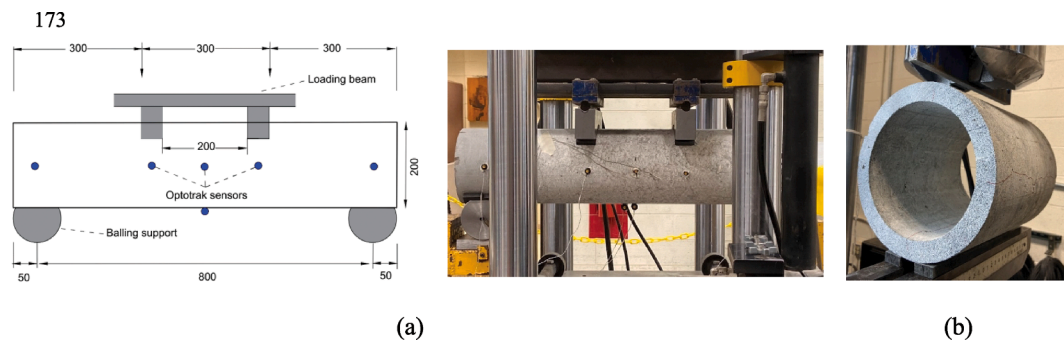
Pipe loading protocol: (a) four-point bending test and (b) three-edge bearing test (ASTM C497 [37]).
